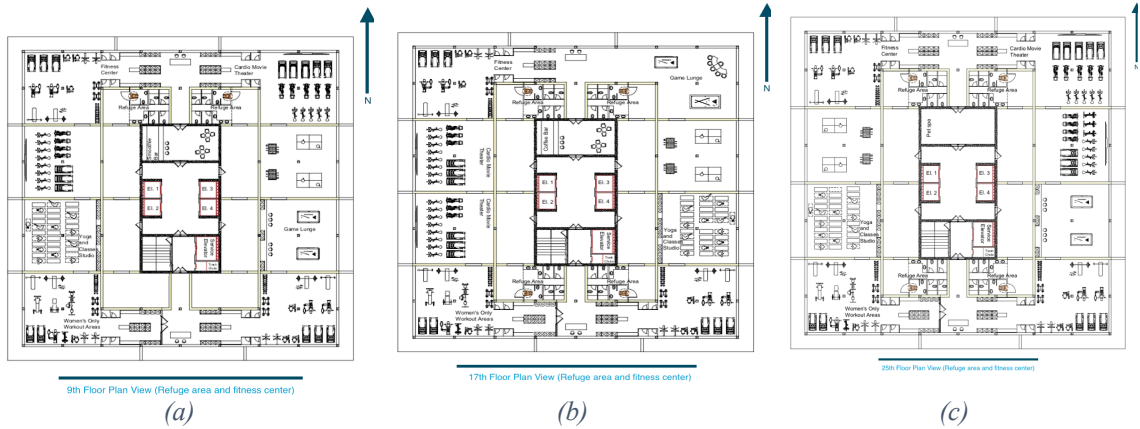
Plan view of refuge areas of: (a) 9th floor, (b) 17th floor, (c) 25th floor [1].
